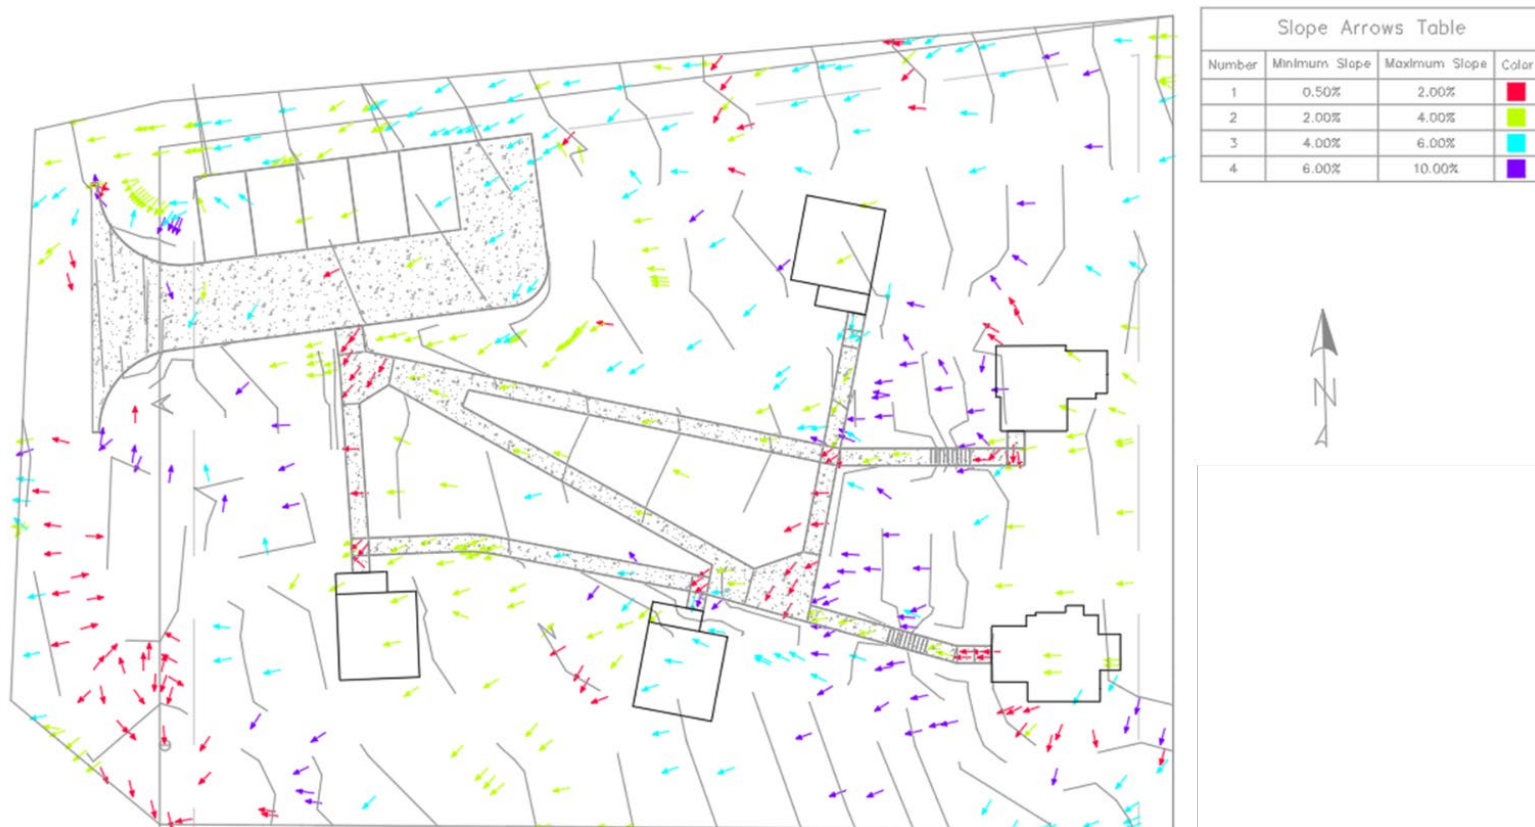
Slope arrow overlay on site for stormwater runoff
